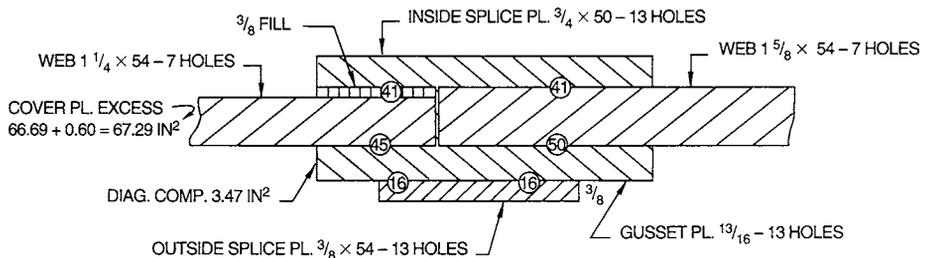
Cross section of chord web-plate splice for example of load factor design.
